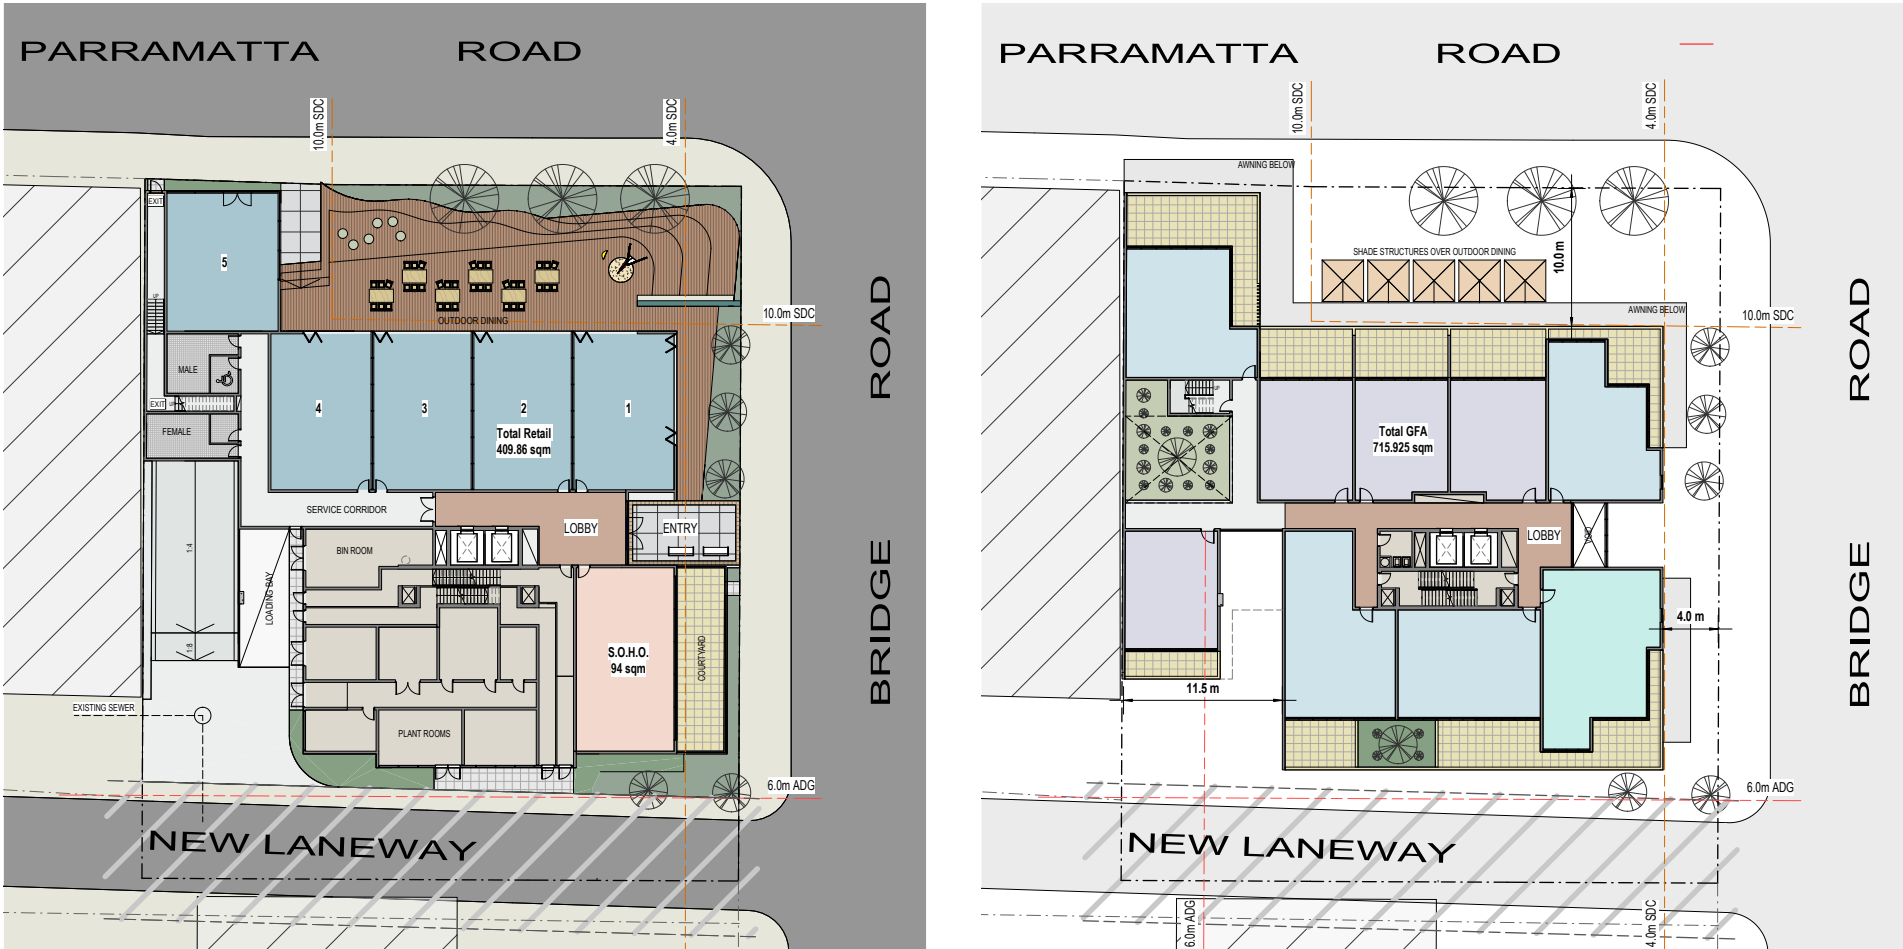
Option 3: Ground floor (left) and level 1 (right) plans
